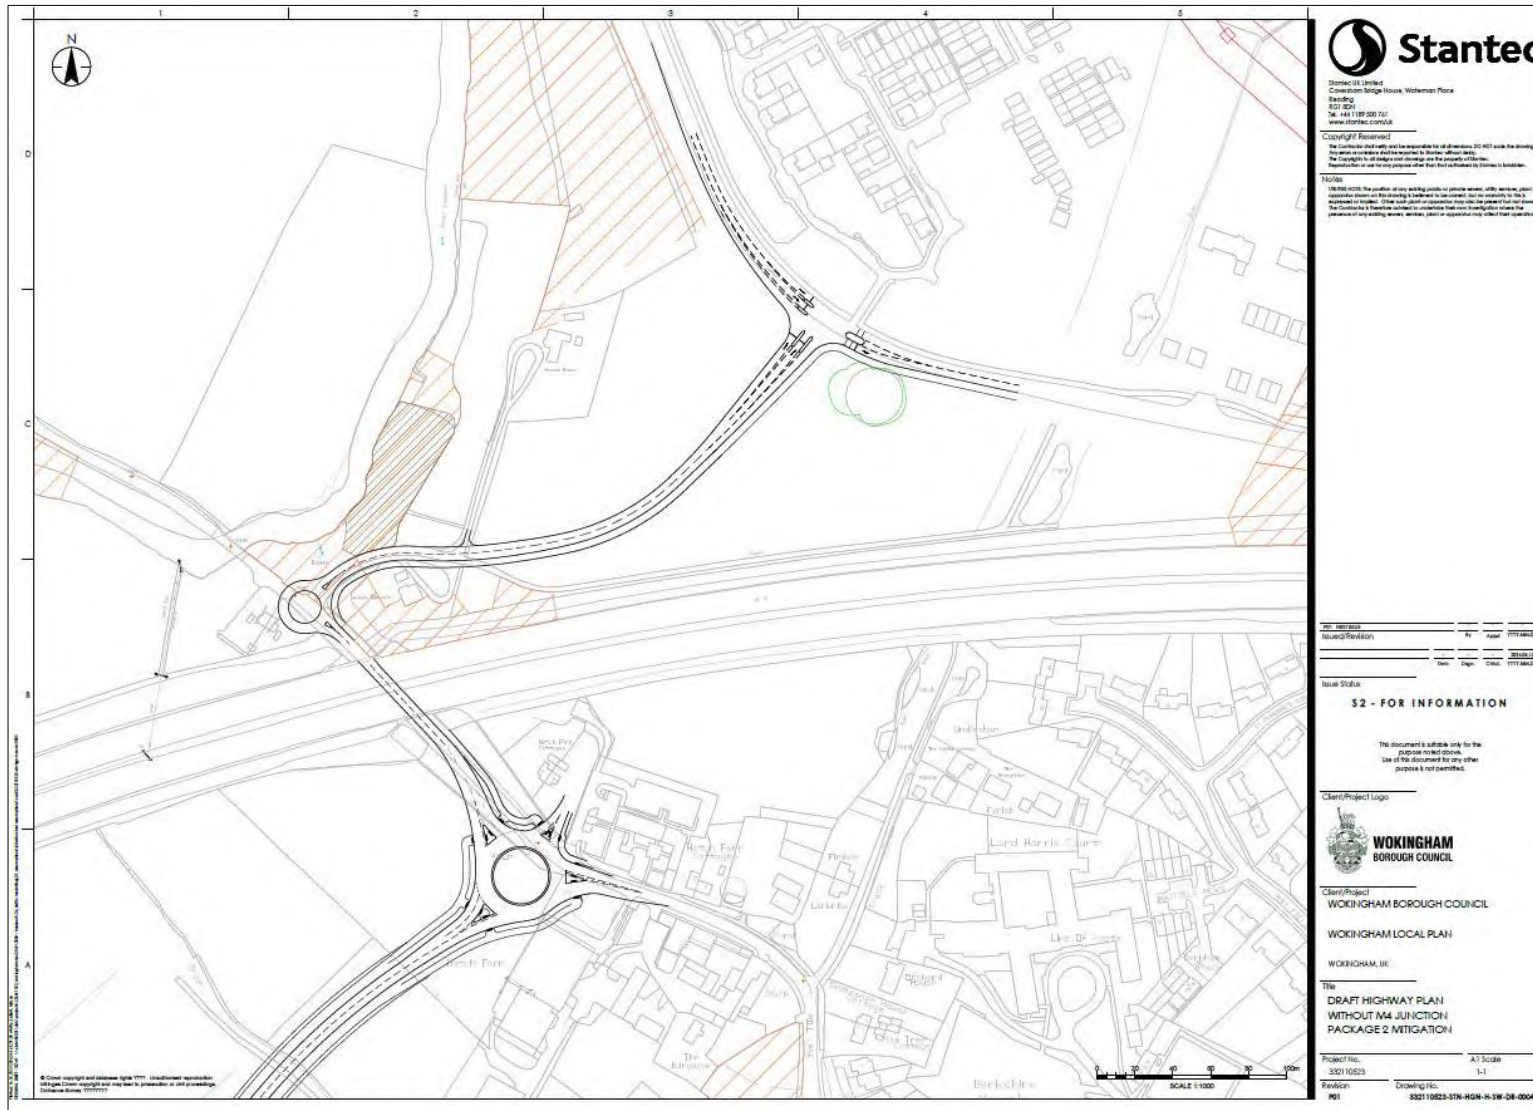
New access to Mill Lane and Connection to Winnersh Relief Road
